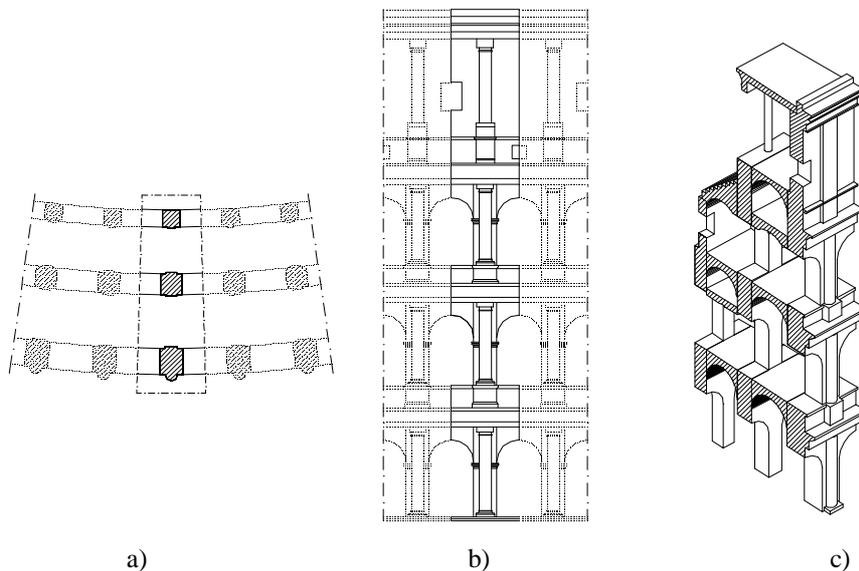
Module of the structure: a) plan; b) front view; c) axonometry.
